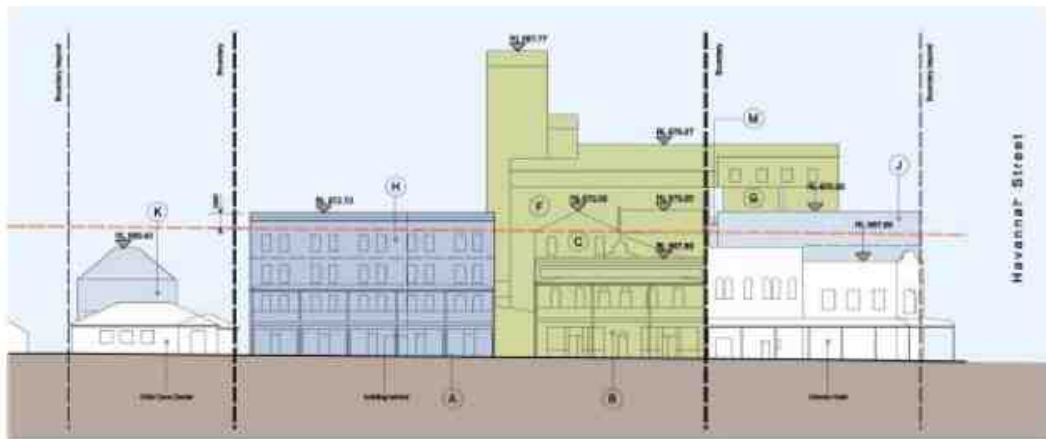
Keppel Street elevation (Source: Karl Walls Design)
